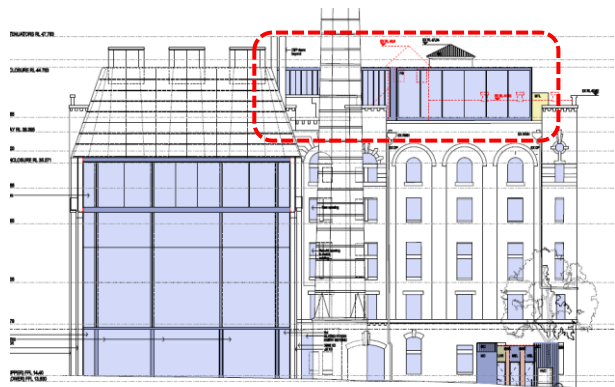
Proposed Level 6 when viewed from the north (facing northern elevation)
